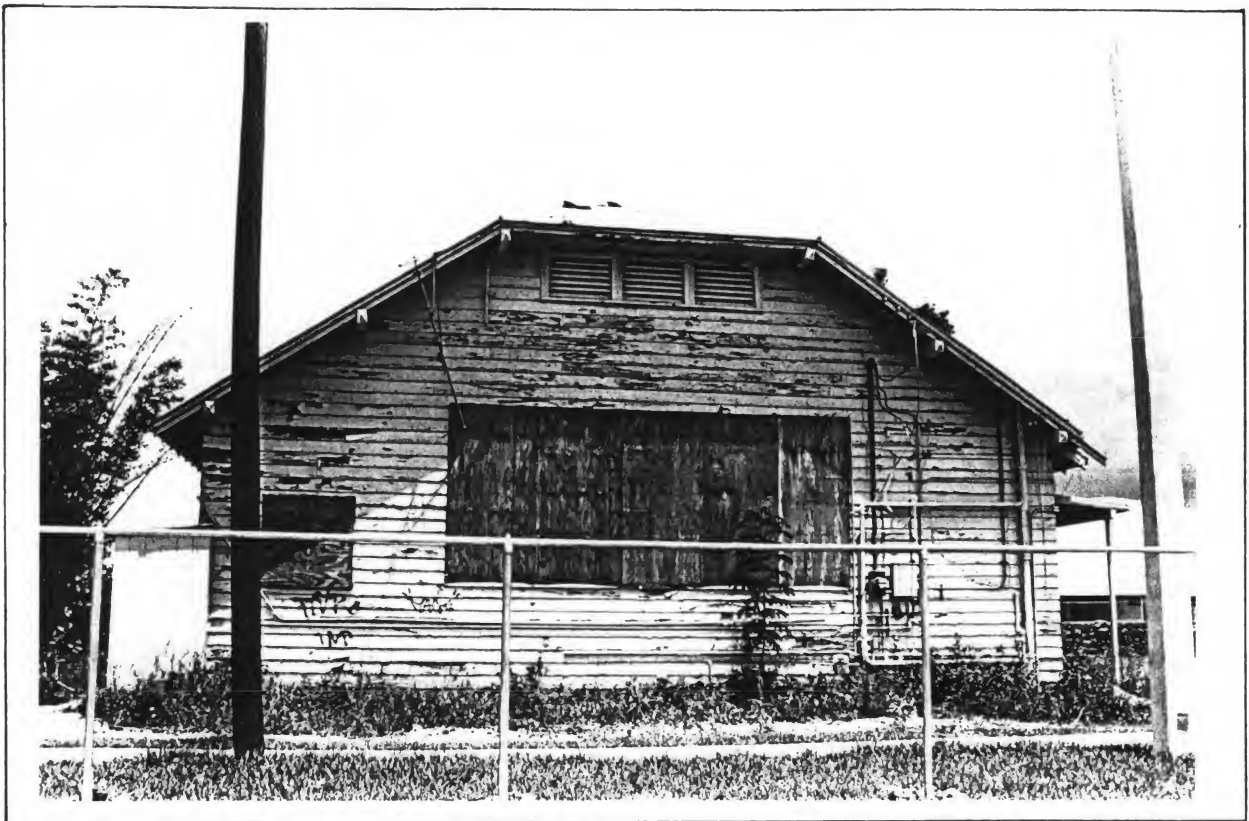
AGRICULTURE BUILDING, WEST (SIDE) ELEVATION.
